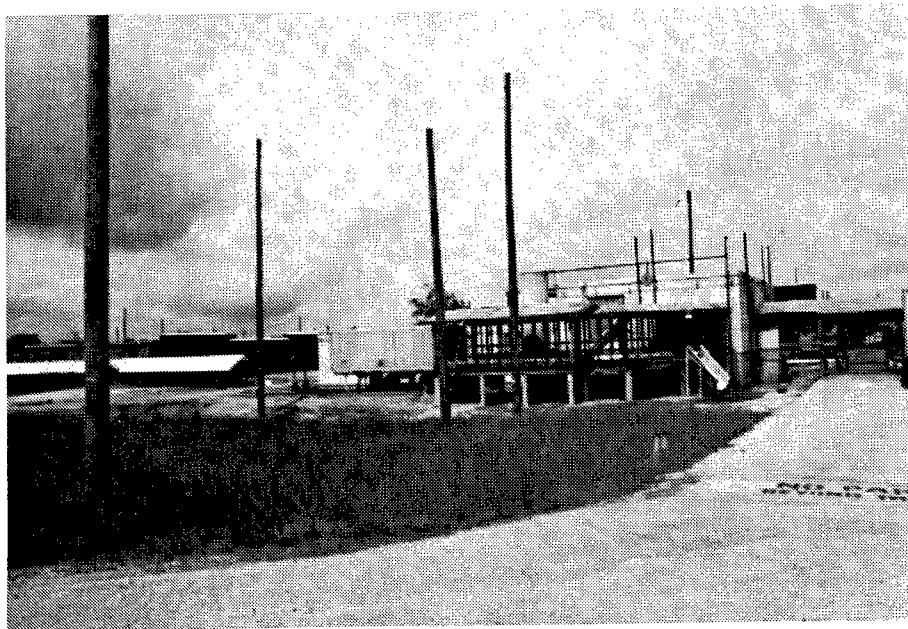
Building M5: Explosives Manufacturing Plant, C-4 Drying Building.
